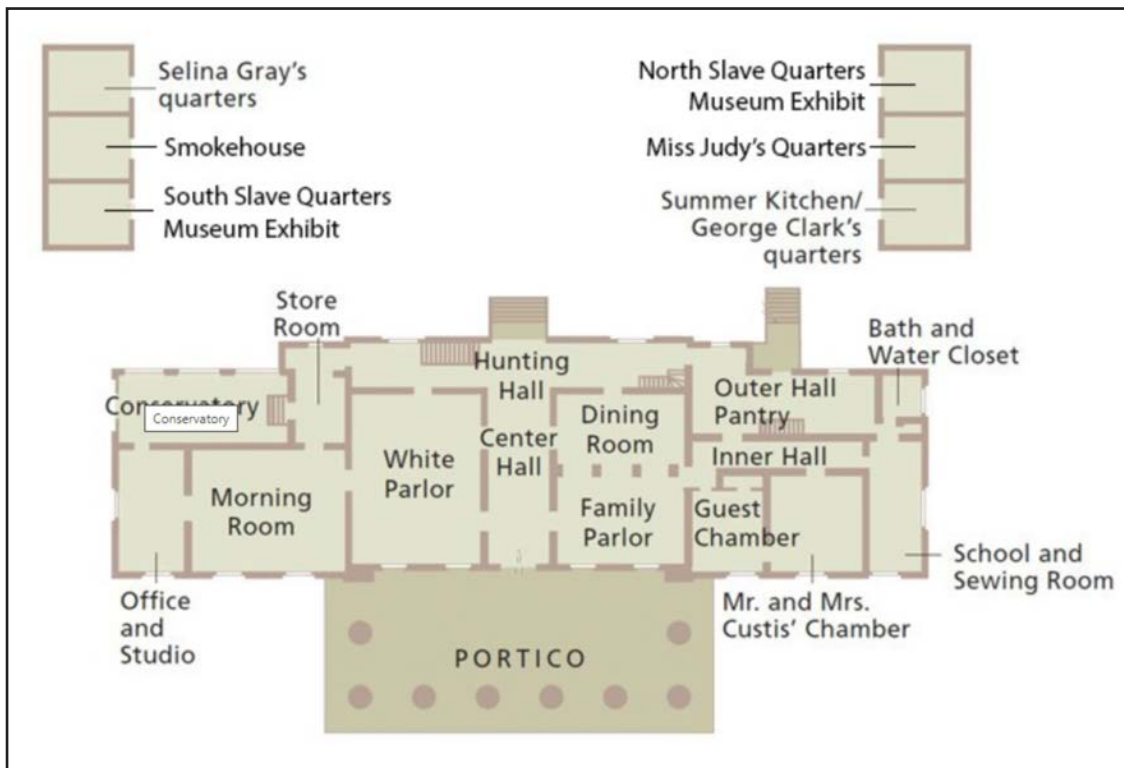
Arlington House (000-0001/0042), interpretive first floor plan of mansion and rear outbuildings/quarters for enslaved servants (NPS 2021).
